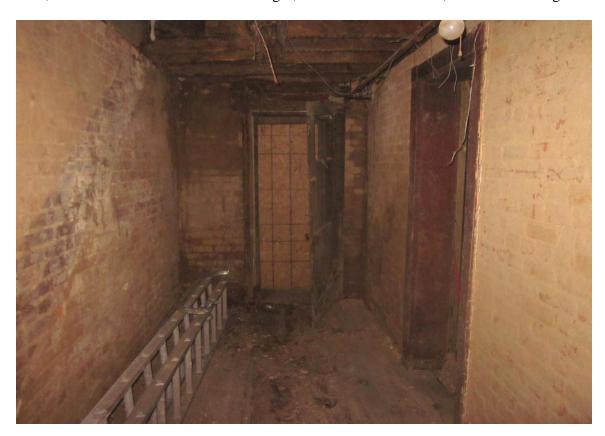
Basement, Hall with entrance to Room 2 at right, rear entrance at center; Wall and Ceiling Finishes
